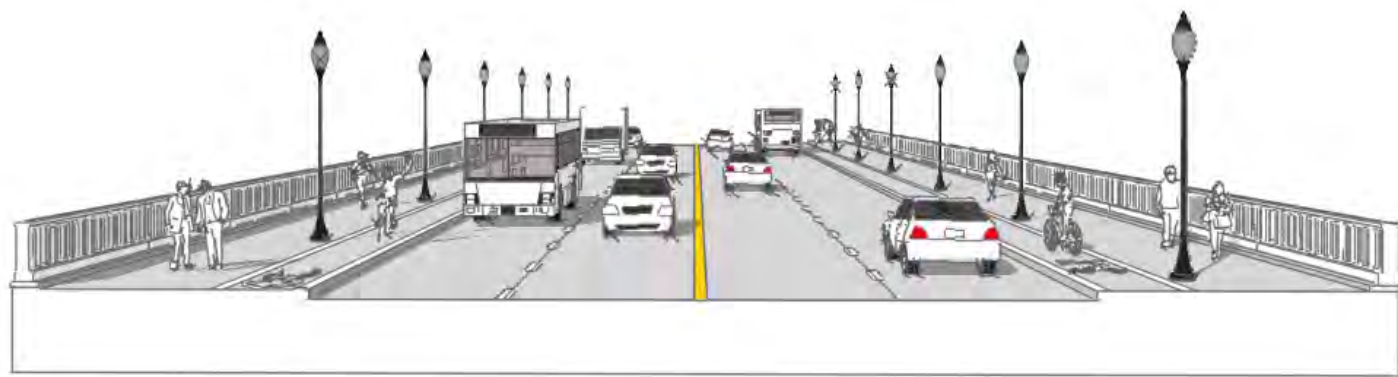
Potential Configuration of a 33rd Street River Crossing
